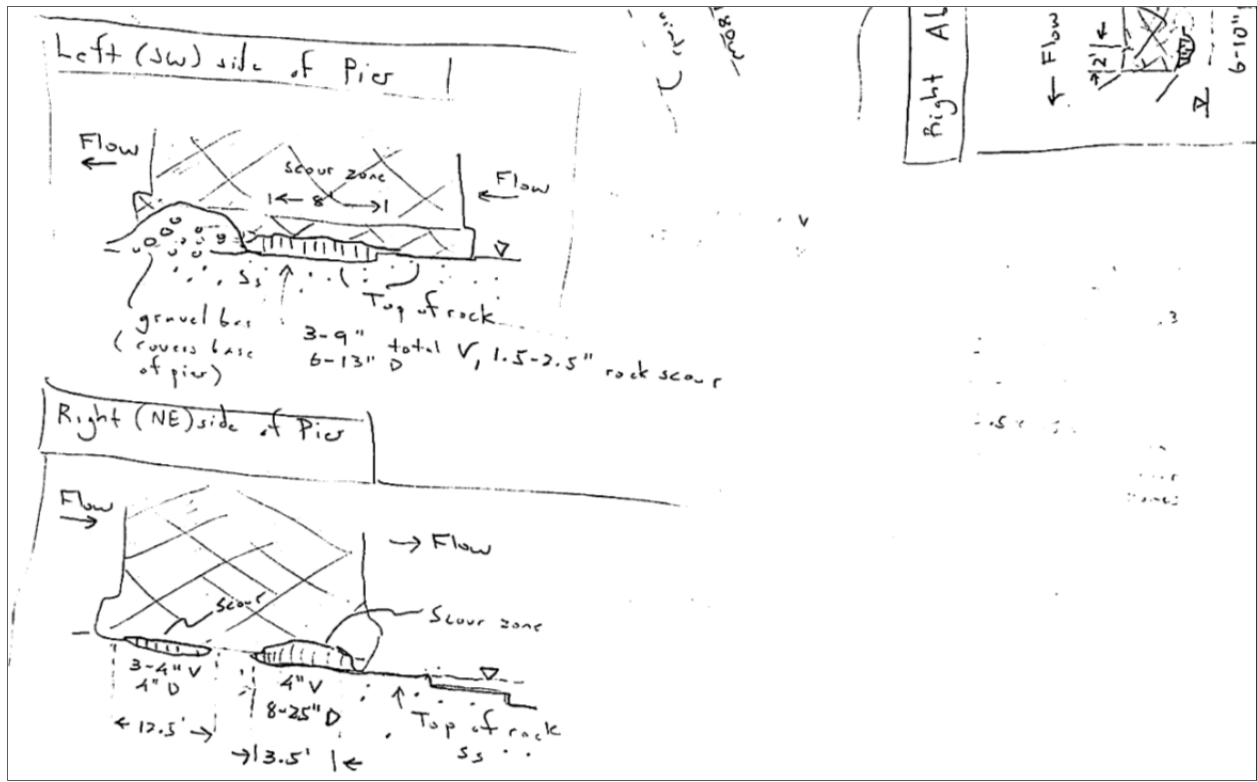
Field sketch of Roaring Creek Bridge, looking at insides of left pier (top sketch) and right pier (bottom sketch).
